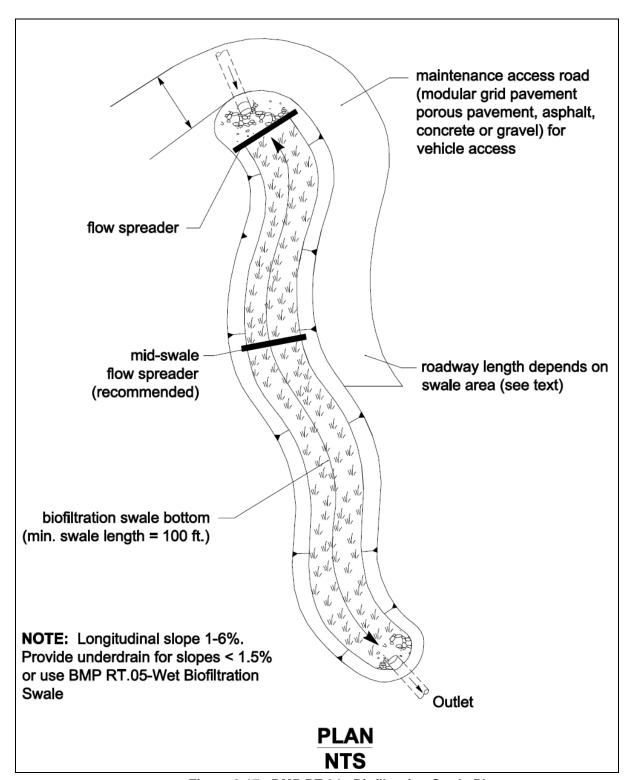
BMP RT.04 - Biofiltration Swale Plan
